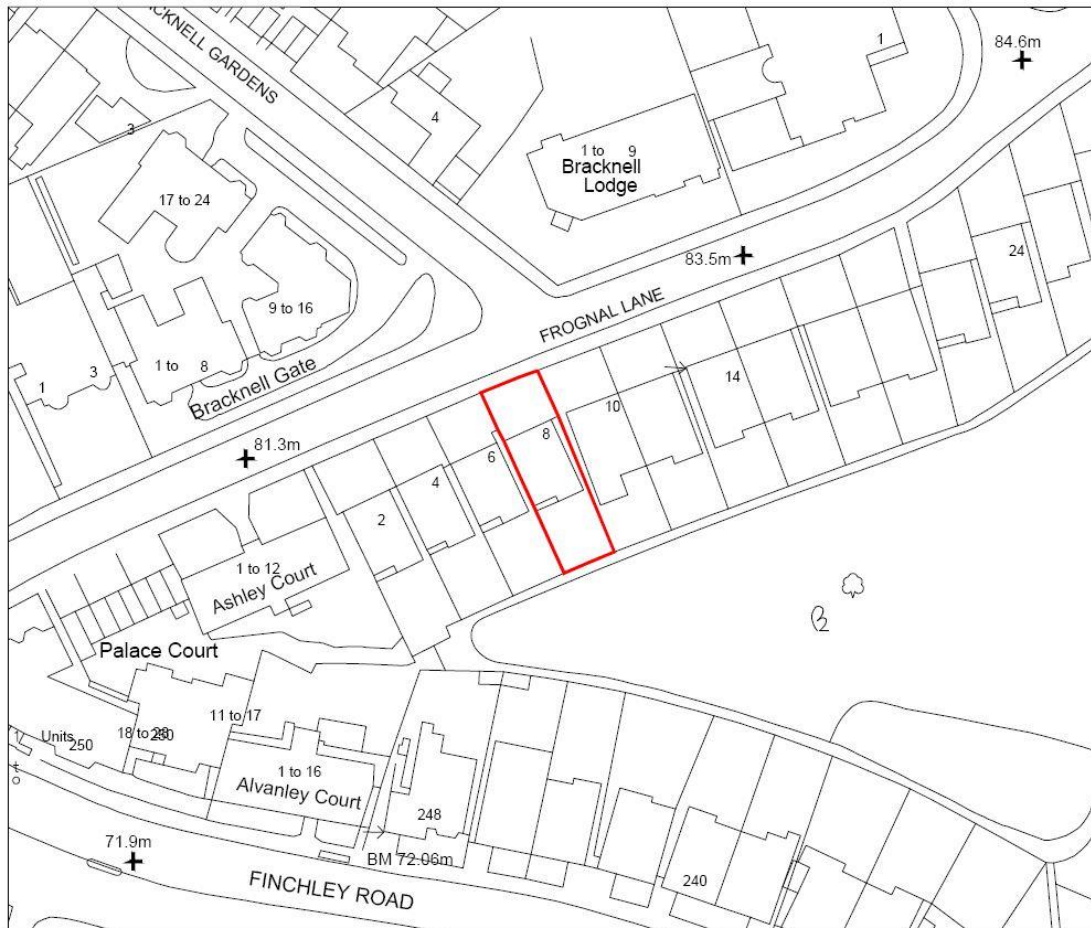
Site Location Plan with application site circled in red (not to scale)
